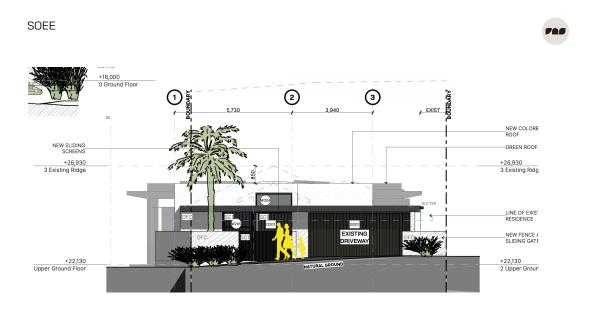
Proposed Dwelling — Southern Elevations (Image Source: Fabric Architecture Studio)
